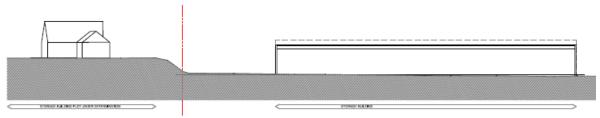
Proposed section of proposed storage building relative to the existing dwellings to the rear of the site.
